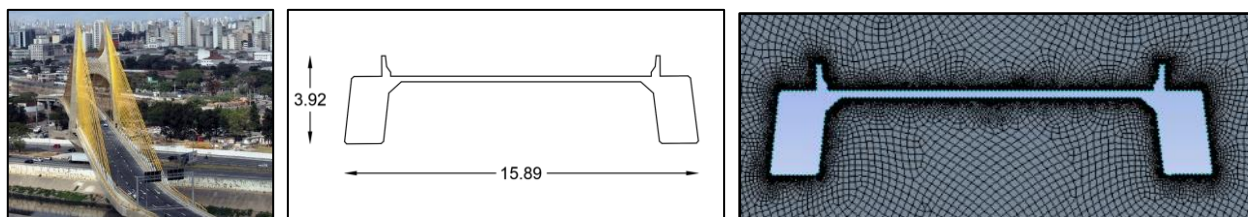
Governador Orestes Quercia cable stayed bridge and the typical cross section.
